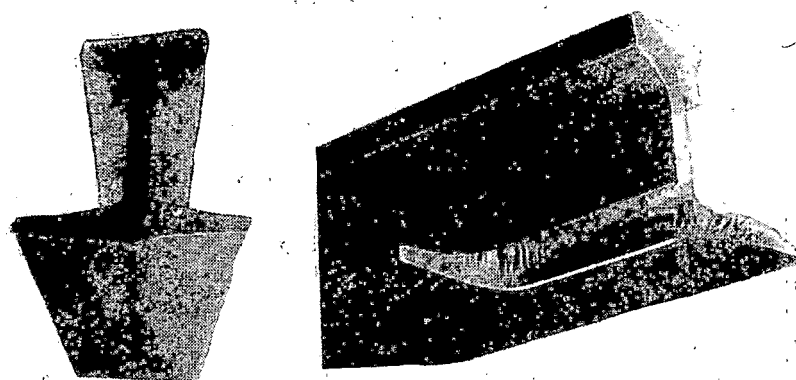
Hair line cracks in the base, cracks and broken places in the base.
